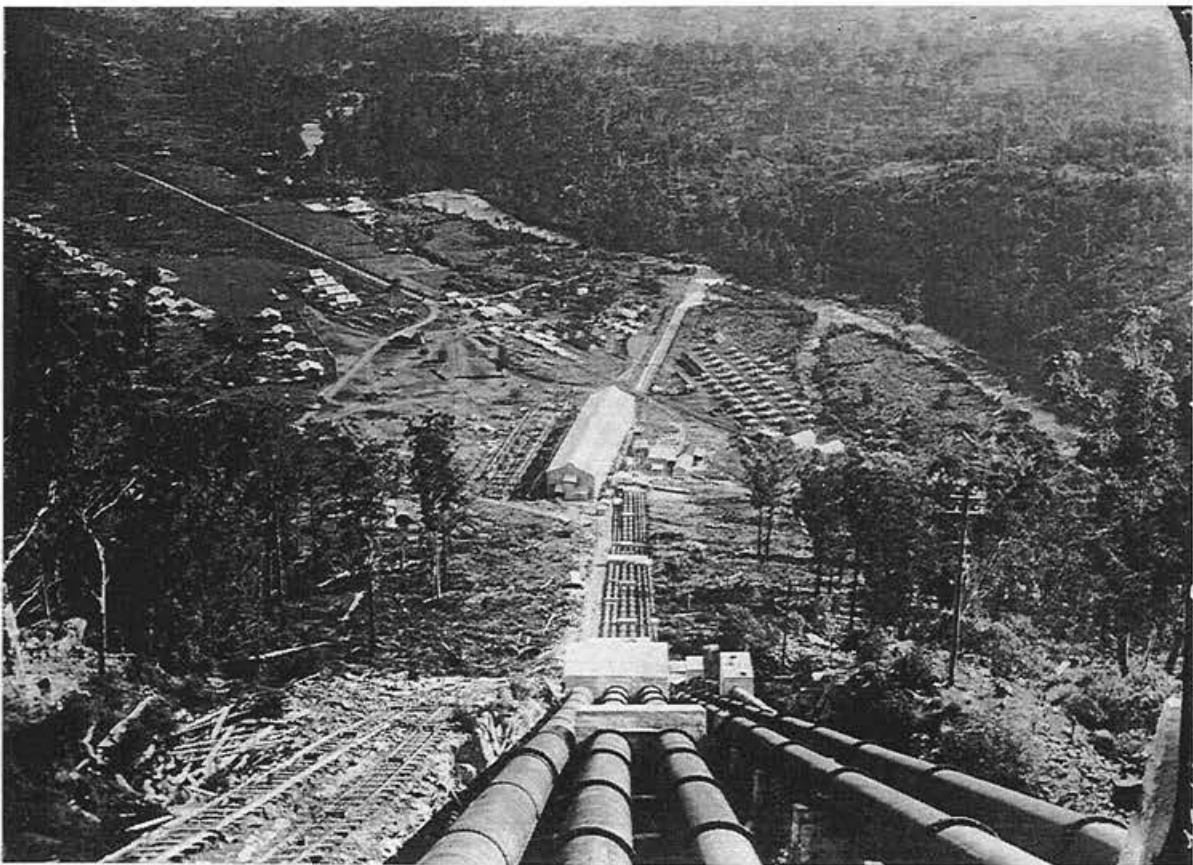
High Pressure Steel Penstocks, Waddamana Power Station, Tailrace, Village & Ouse R. (c. 1923 - looking South).
